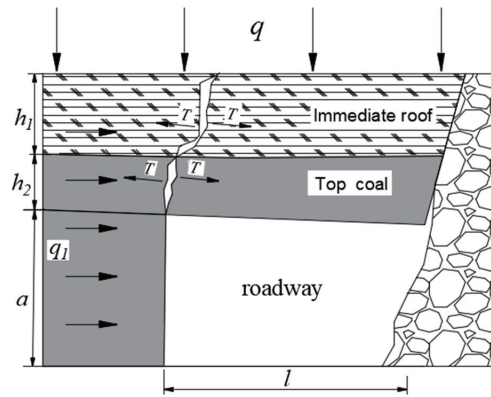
Mechanical model of roof damage after roof cutting.
